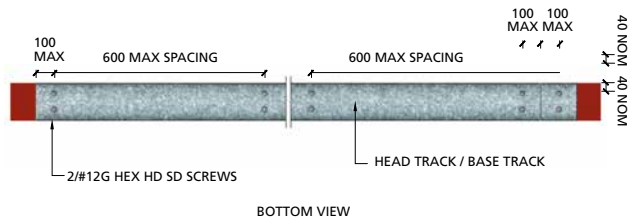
(B)a: TRACK FIXING TO STEEL SUBSTRATE (TRACK WIDTH 51,64,76 AND 92mm)
